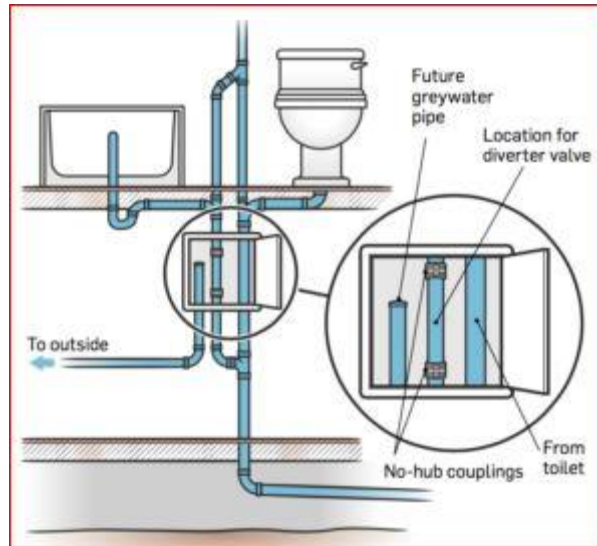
Illustration of installing greywater pipes(Allen, 2018)
